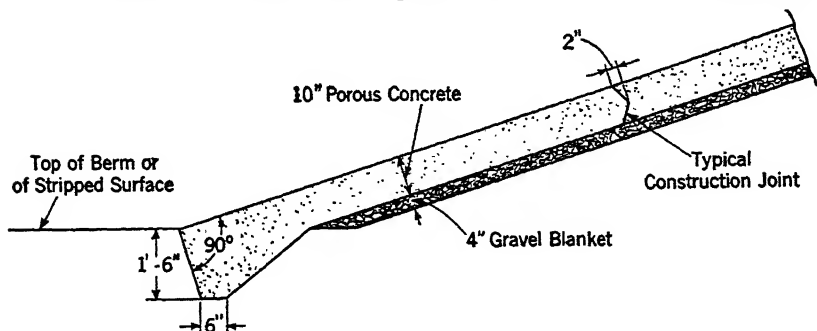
Porous concrete slab slope protection in lieu of riprap as used by Harza Engineering Co. on Santee Cooper project, South Carolina.
